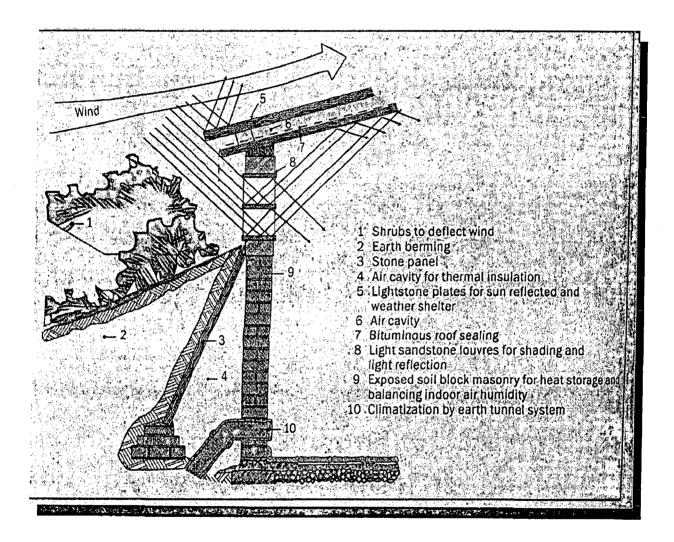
WALL SECTION SHOWING EARTH BERMING AND
